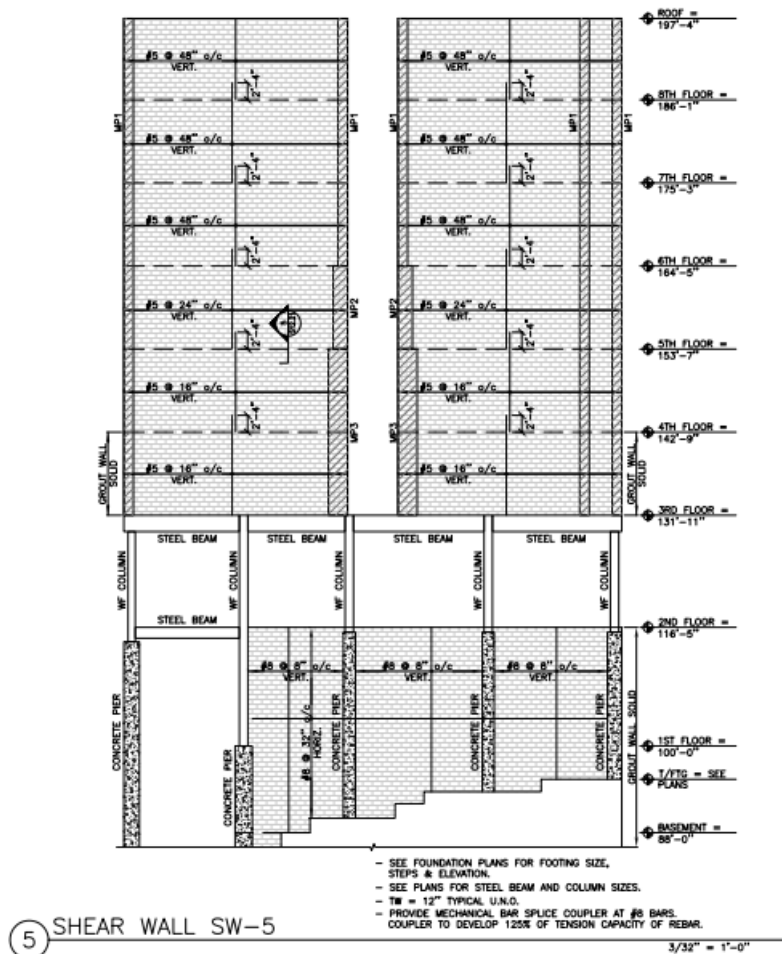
Shear Wall with Steel Moment Frames (S10.1 Drawing 5)
